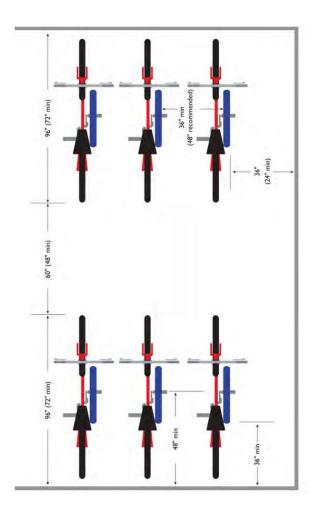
Typical Layout of a Bike Parking Room (Source: APBP<sup>2</sup>)
